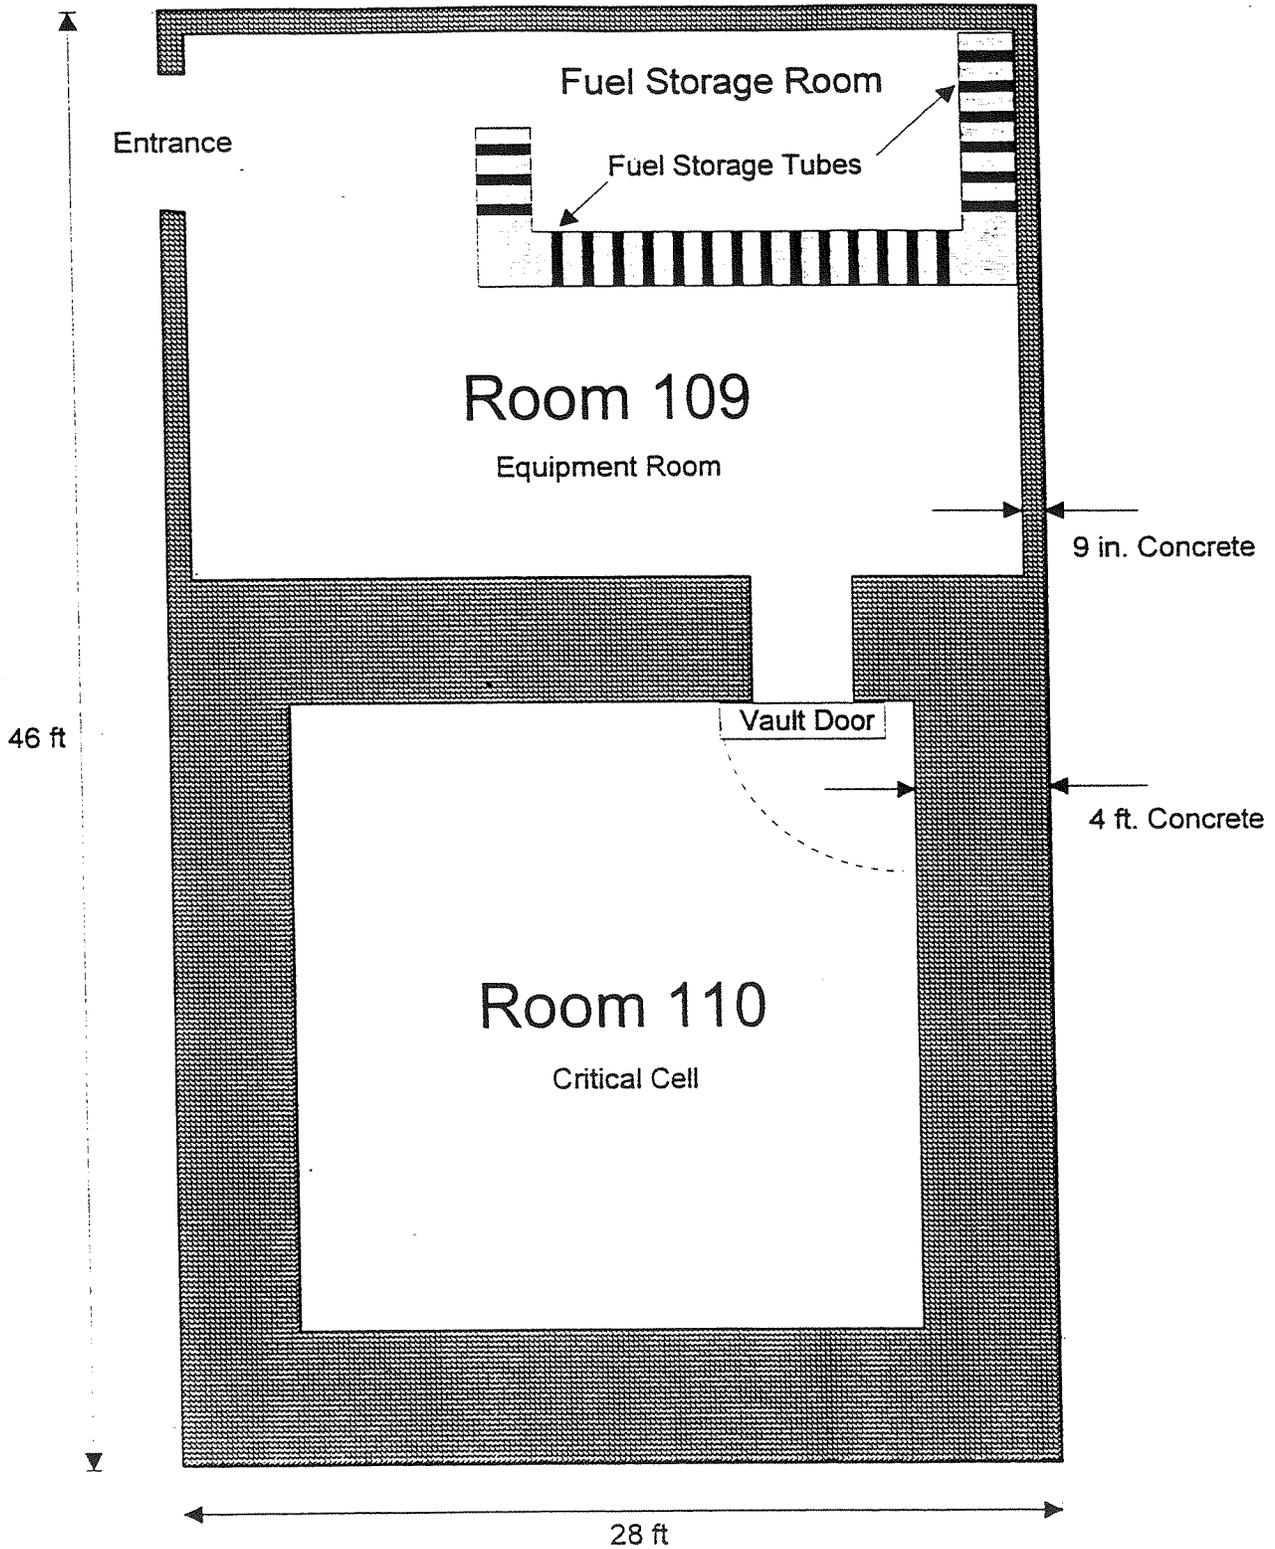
Existing Layout of Building T012 Critical Cell and Equipment Room
